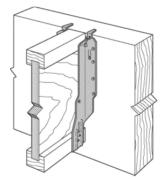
TYPICAL IUS HANGER INSTALLATION (Supported Wood I-joist without Web Stiffeners)
